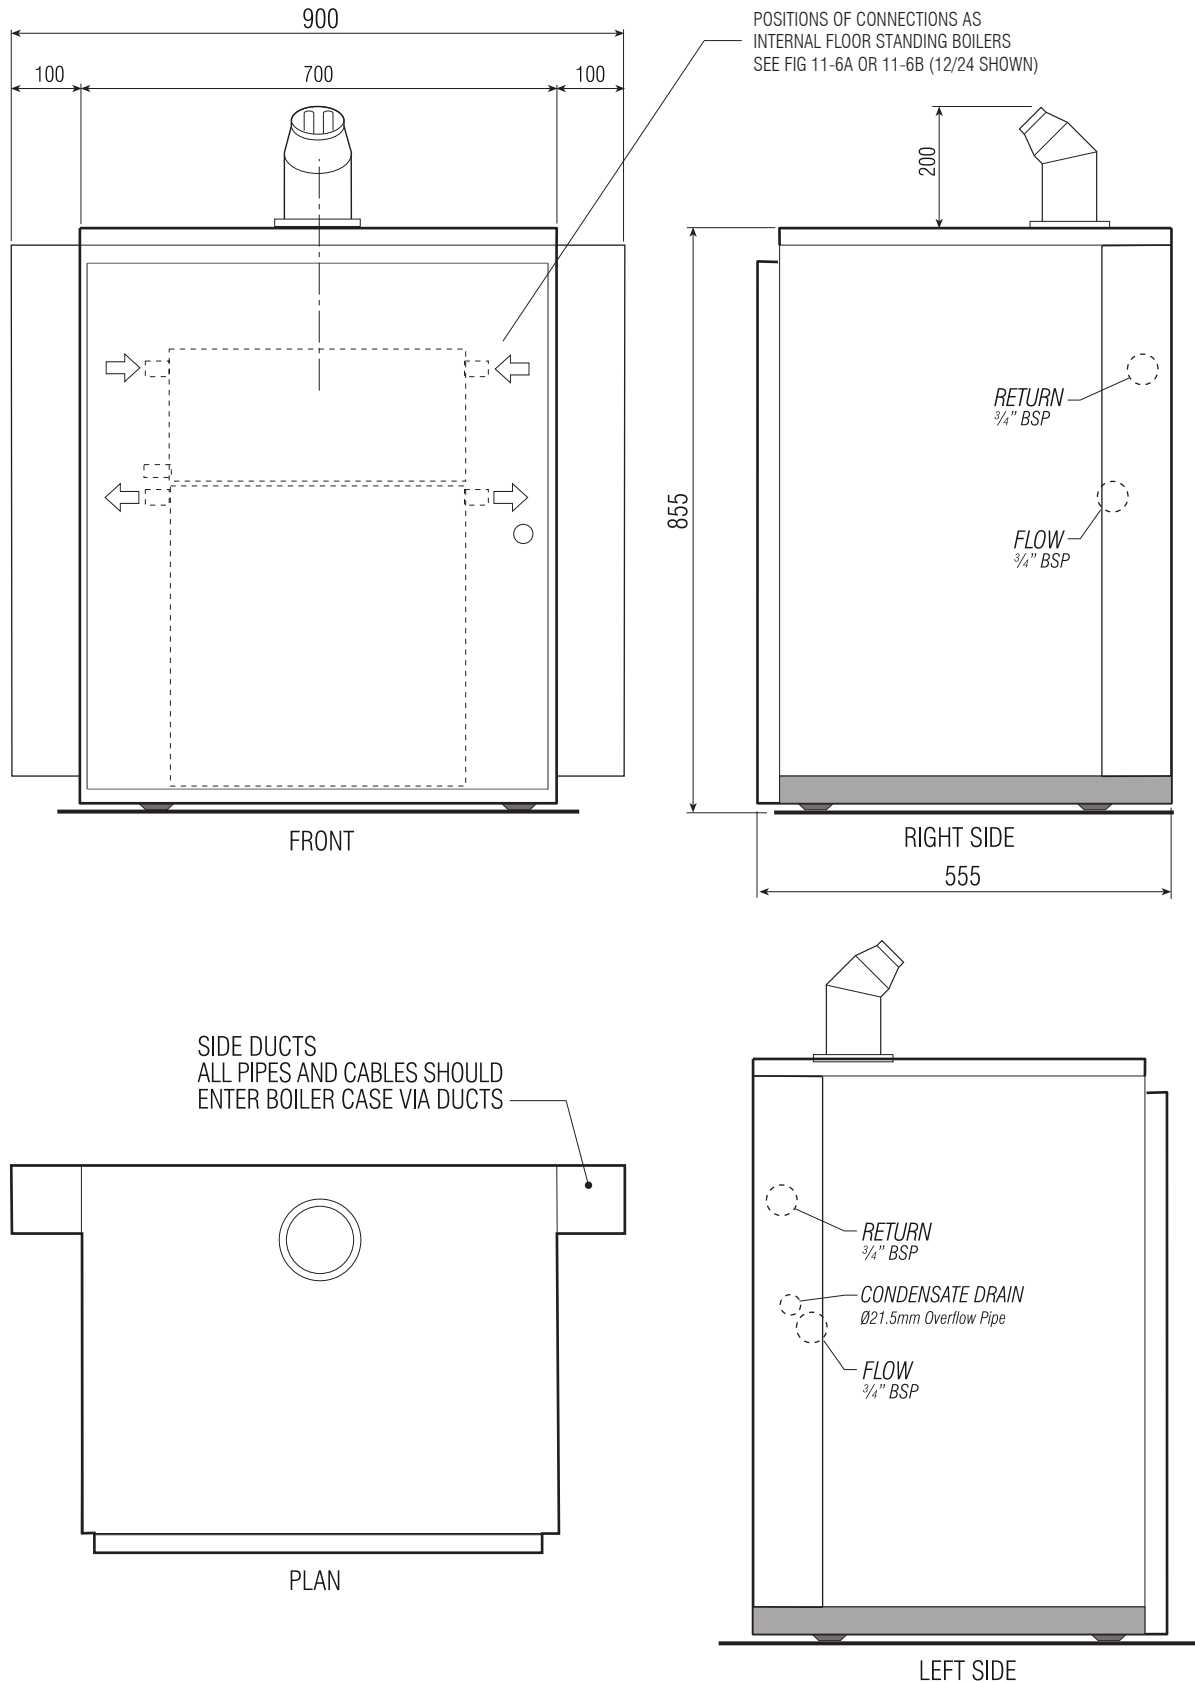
Overall Dimensions EXTERNAL FLOOR STANDING
